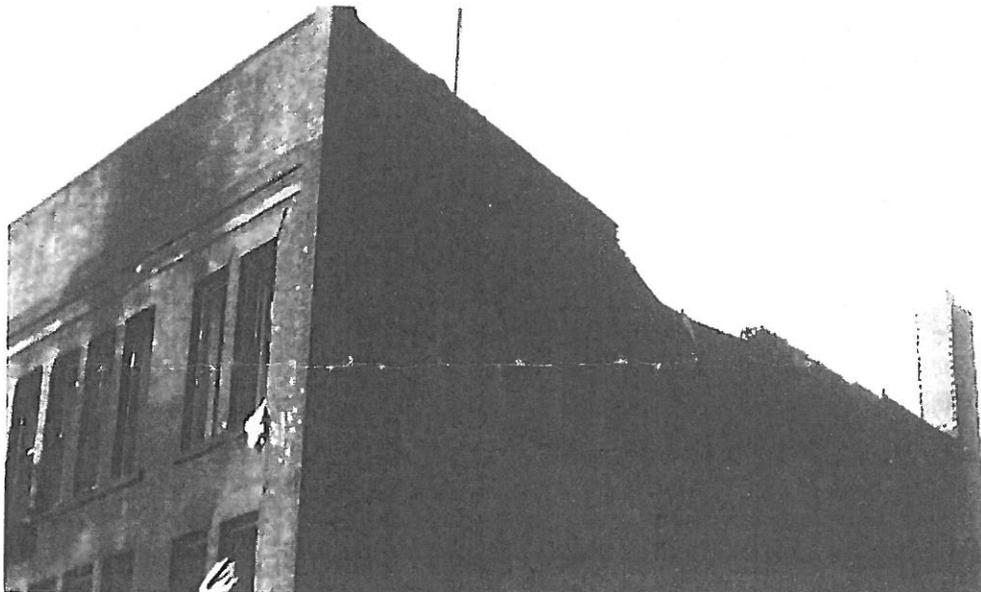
This is a photo taken from the C2HEM Urban Consulting Engineers report of January 2012, showing the North Wall condition in December 2011 after the fire damage. Compare this photo to the previous photos 1, 2 and 3 above to see the collapse of the North and Rear Walls over the previous three years.
